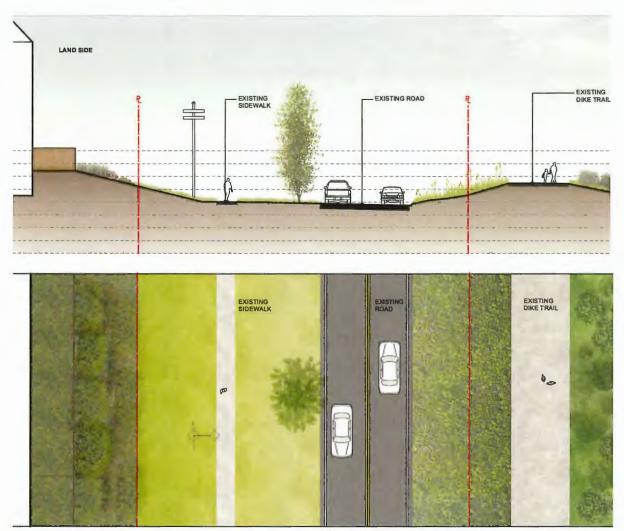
Section and plan view of existing conditions between Lynas Lane and No. 2 Road
